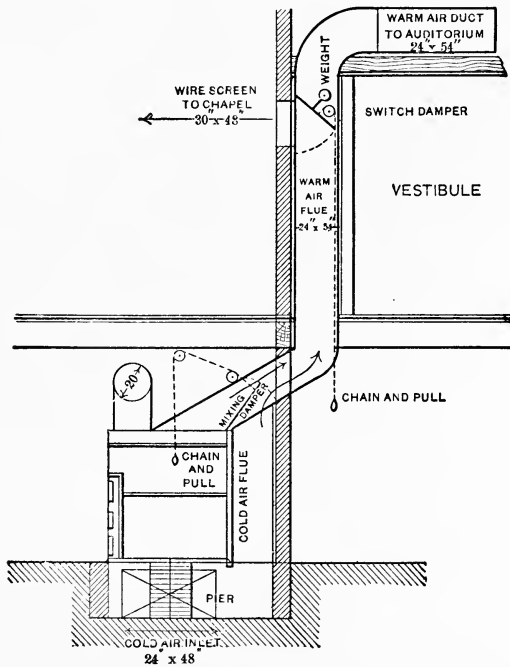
Section at B B, Showing Mixing Damper and Switch Damper.
